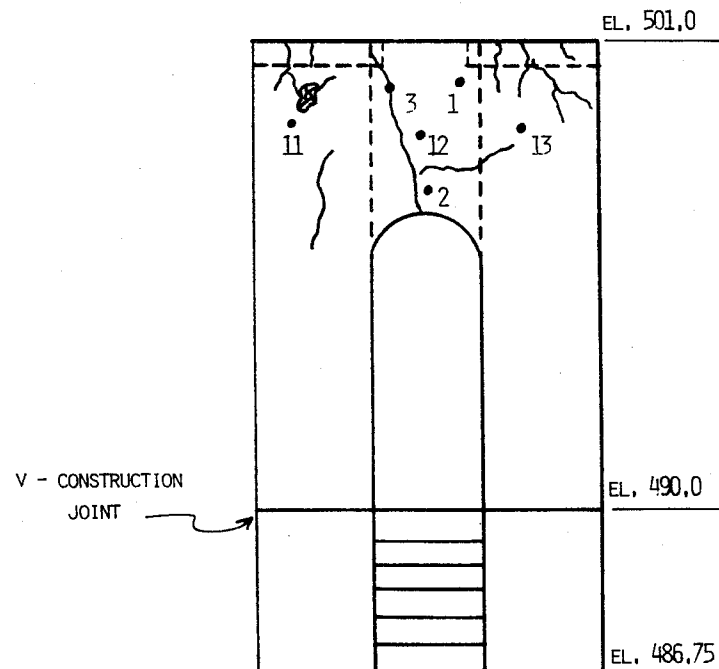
Downstream view showing major cracks and locations of injection ports (Flock and Walleser, 1983).
